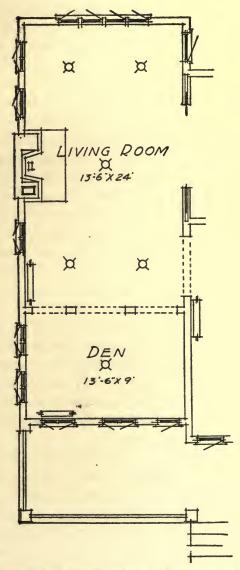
Part Plan, Showing Method of Overrunning Corners.
